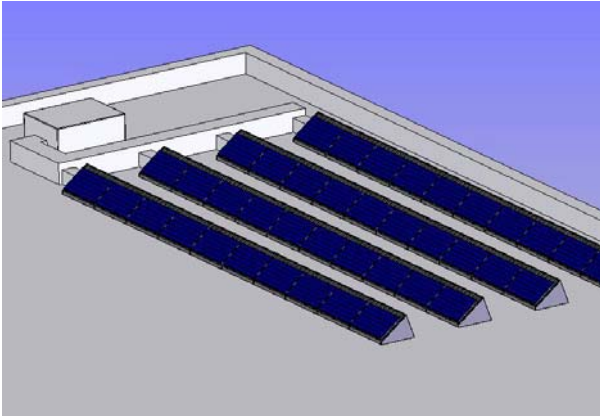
Concept for typical roof mounted PV/T system connected to rooftop HVAC units
